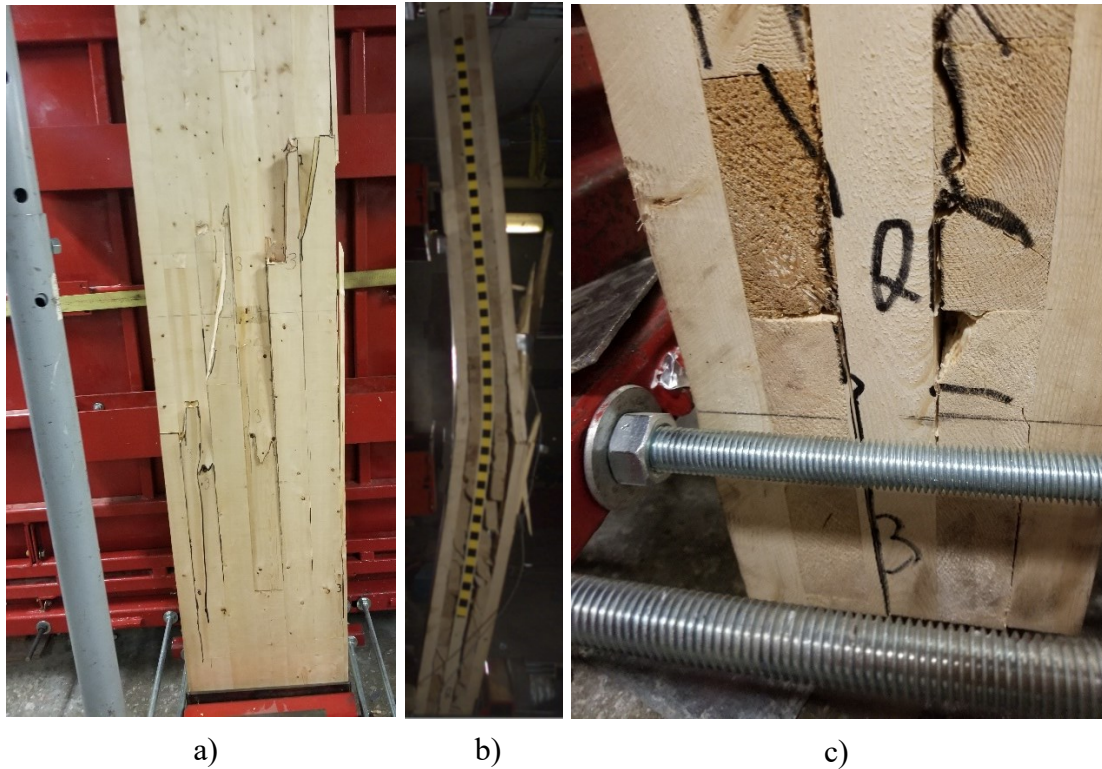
a) Tension face, with flexural fractures b) Point of maximum displacement, illustrating failure behaviour c) Crack extension past support and through end of panel
